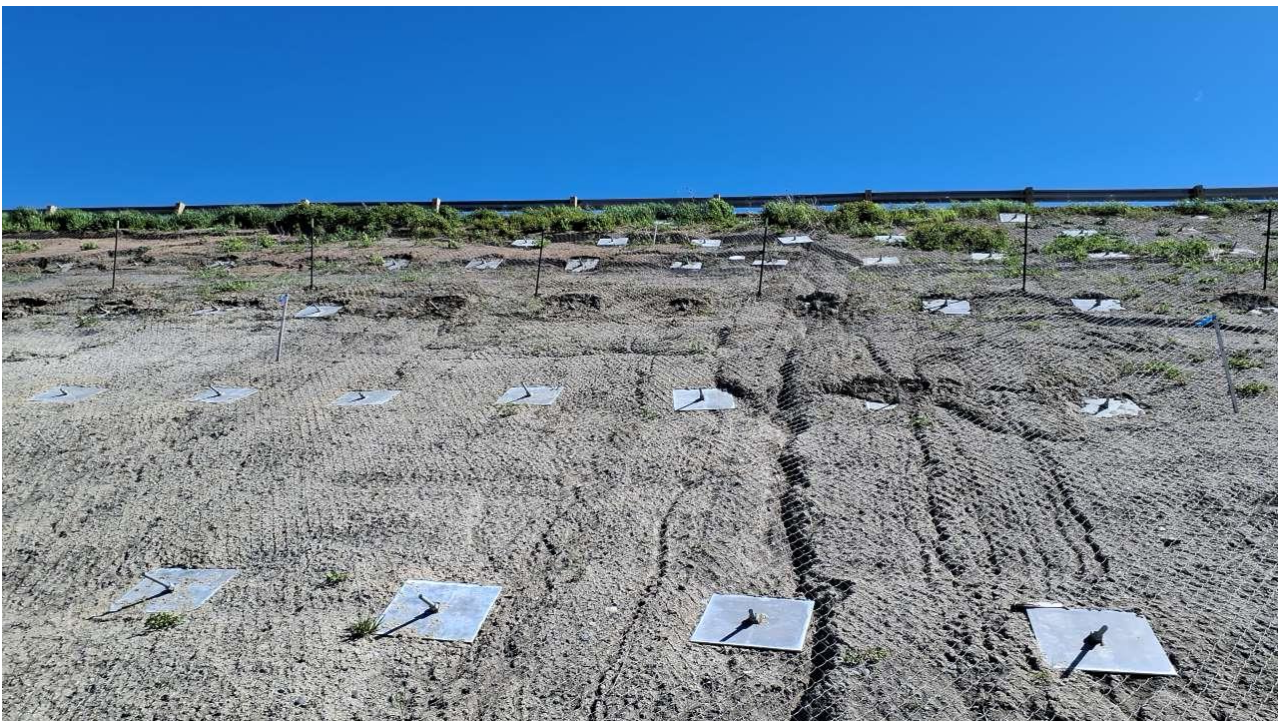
Soil nails installed with anchor plates. Slope movement, cracking and sloughing of the slope. Photo taken facing west on May 29, 2024.
